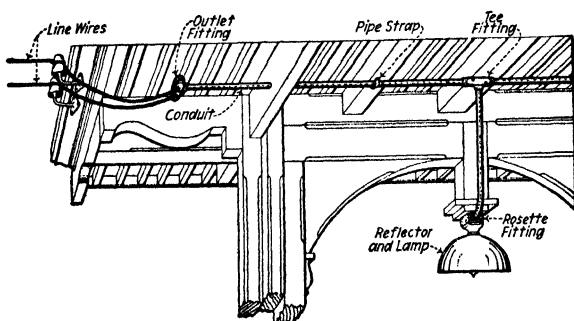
Exposed-conduit installation in a pavilion. (Crouse-Hinds.)
